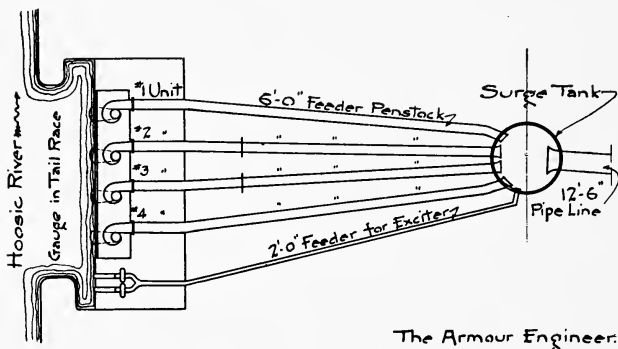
Plan of Penstocks, Surge Tank and Power House.
